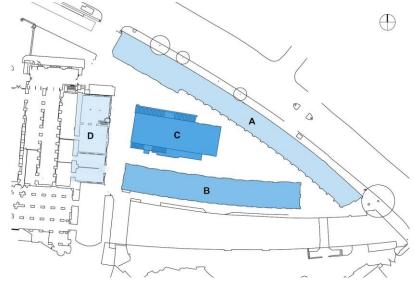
Stables Market - Listed group of buildings, subject site Building B
